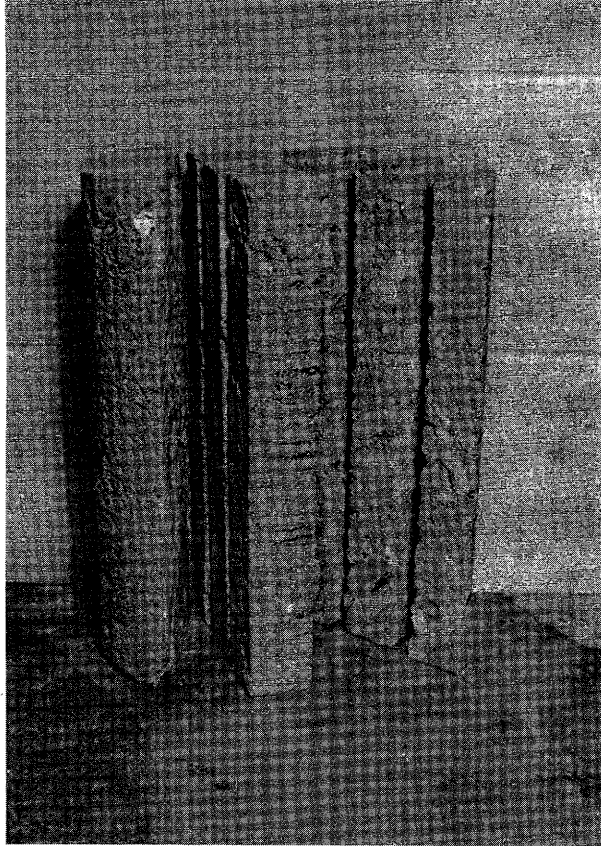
SPECIMEN SAWED IN VERTICAL SECTIONS
